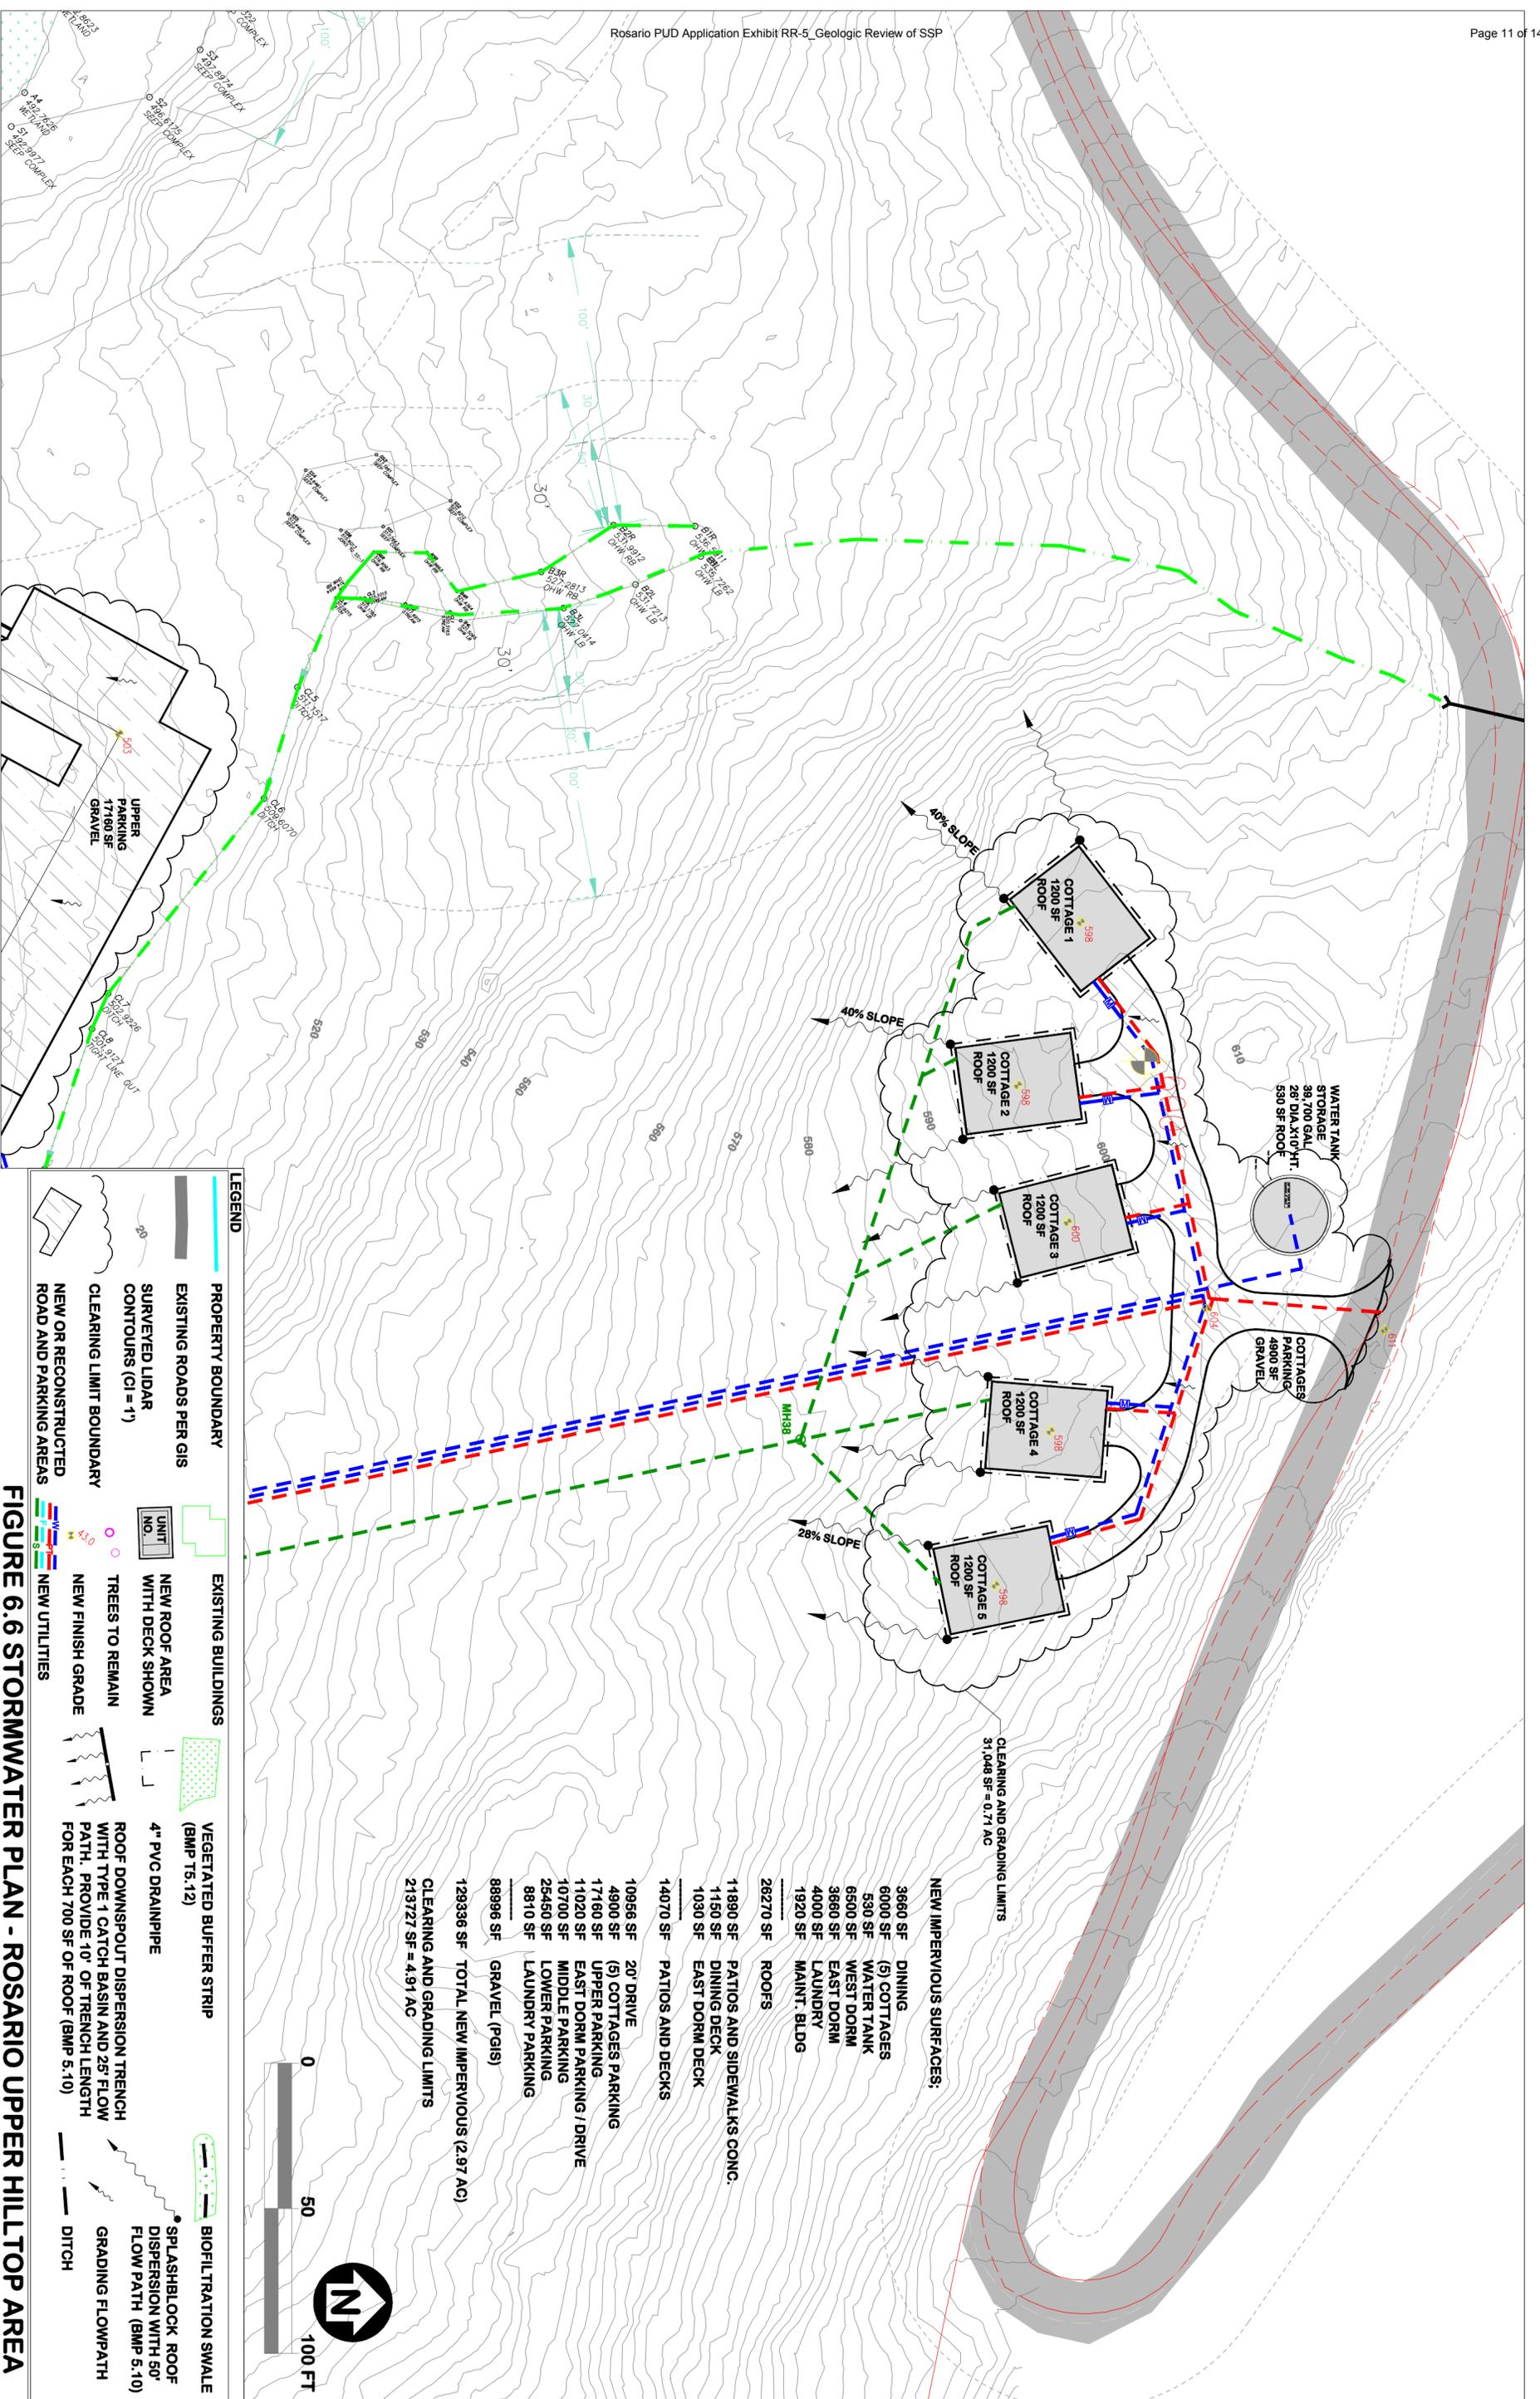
STORMWATER PLAN - ROSARIO UPPER HILLTOP AREA
